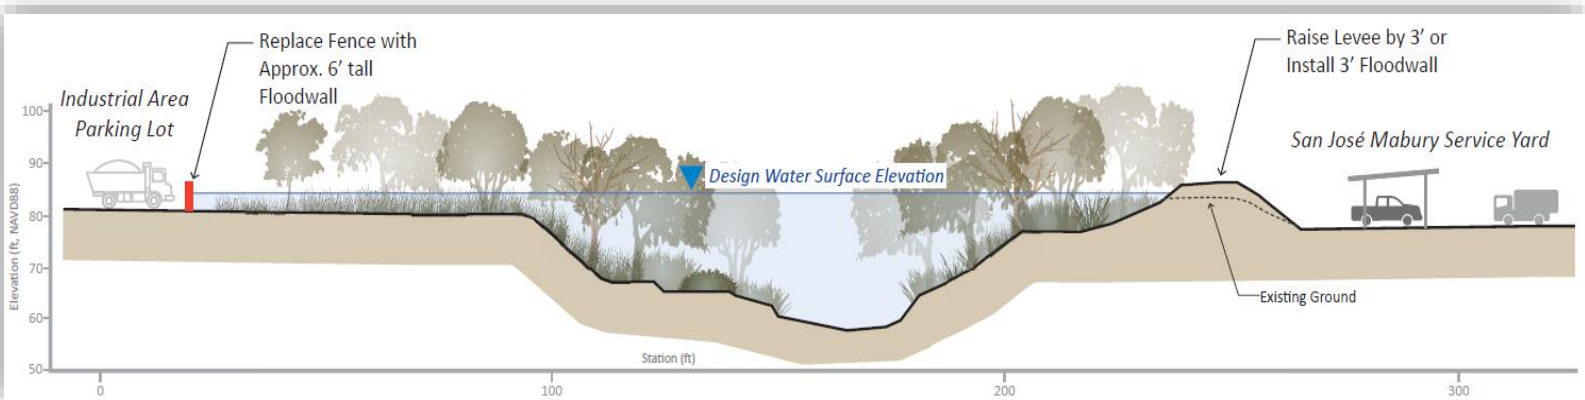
Reach 6 – Floodwalls/berm proposed along west and east Coyote Creek top of banks, between Mabury Road and Highway 101
